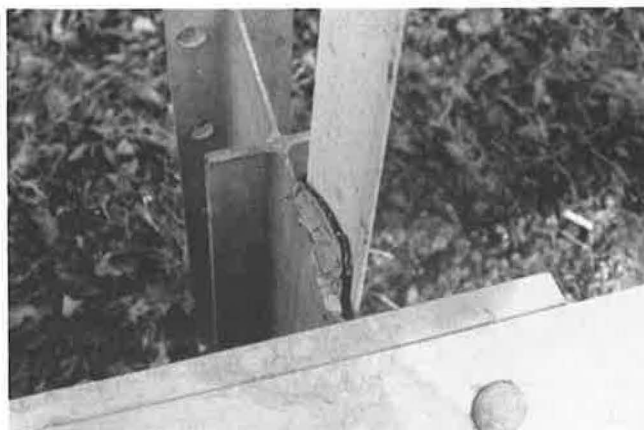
Carson delineator panel suffering from cracked and separated adhesive mounting.
